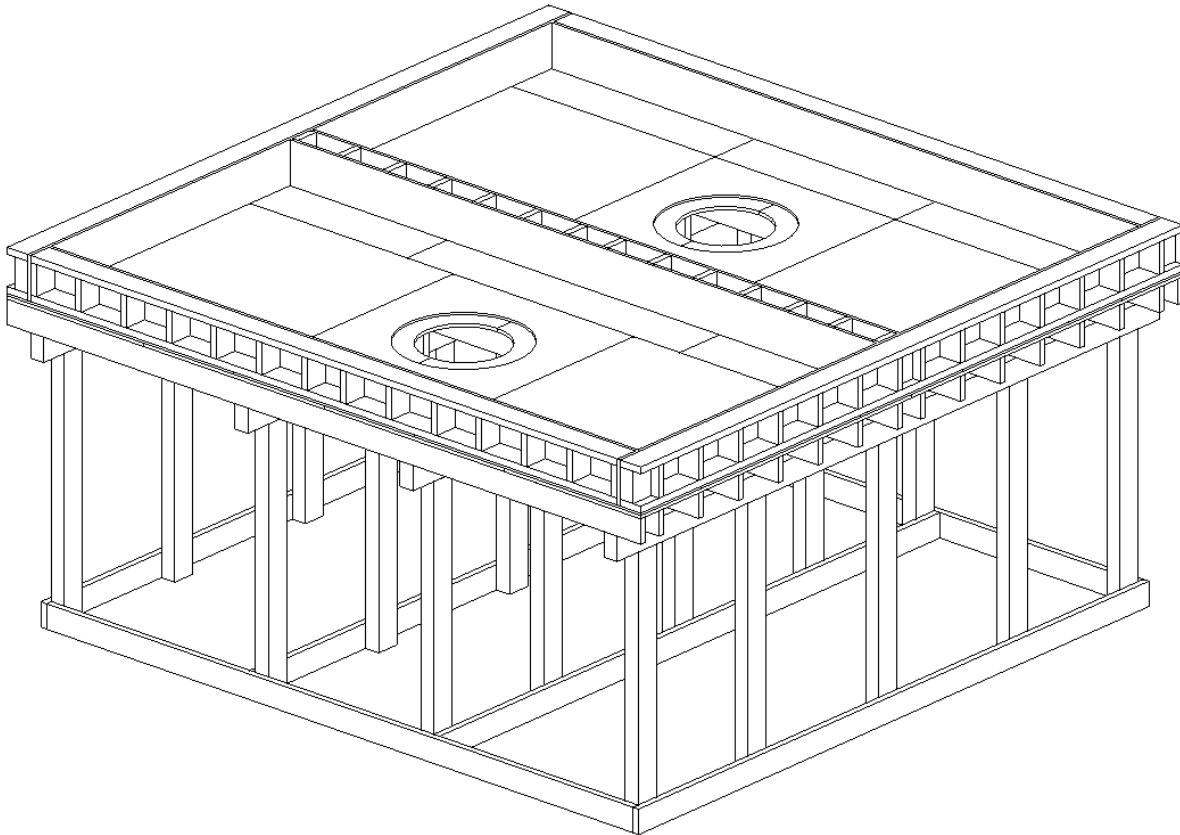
Slab Longitudinal Reinforcement Overview
